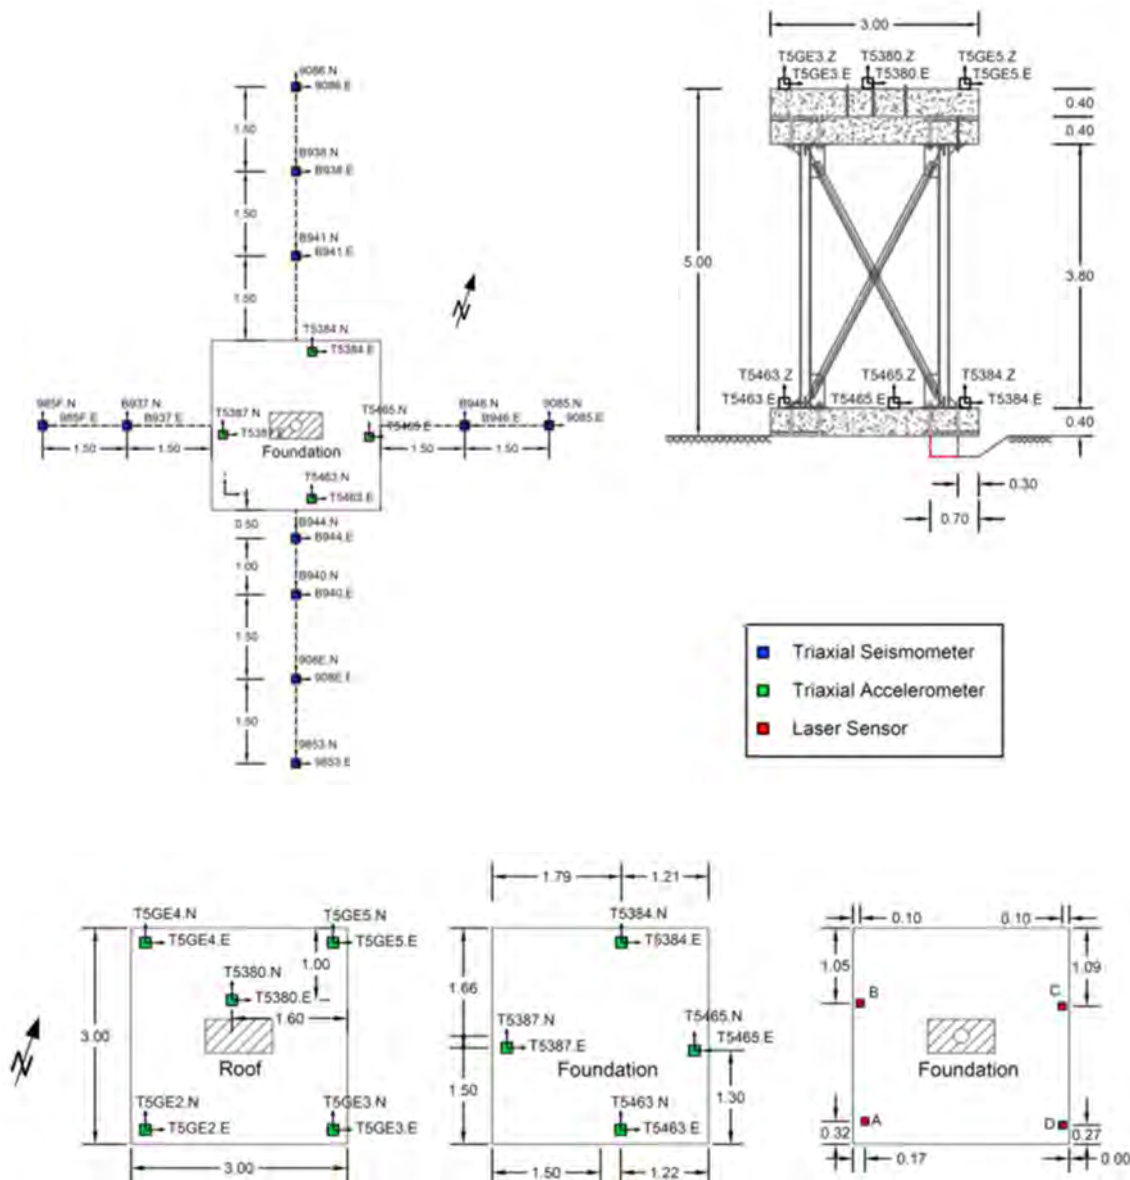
Plan view of the instrumentation layout of the foundation and the soil surface (upper left), of the roof and foundation slab (bottom) and a cross-section of the layout with the scour holes of $s = 0.3\text{m}$ (black line) and $s = 0.7\text{m}$ (red line)
